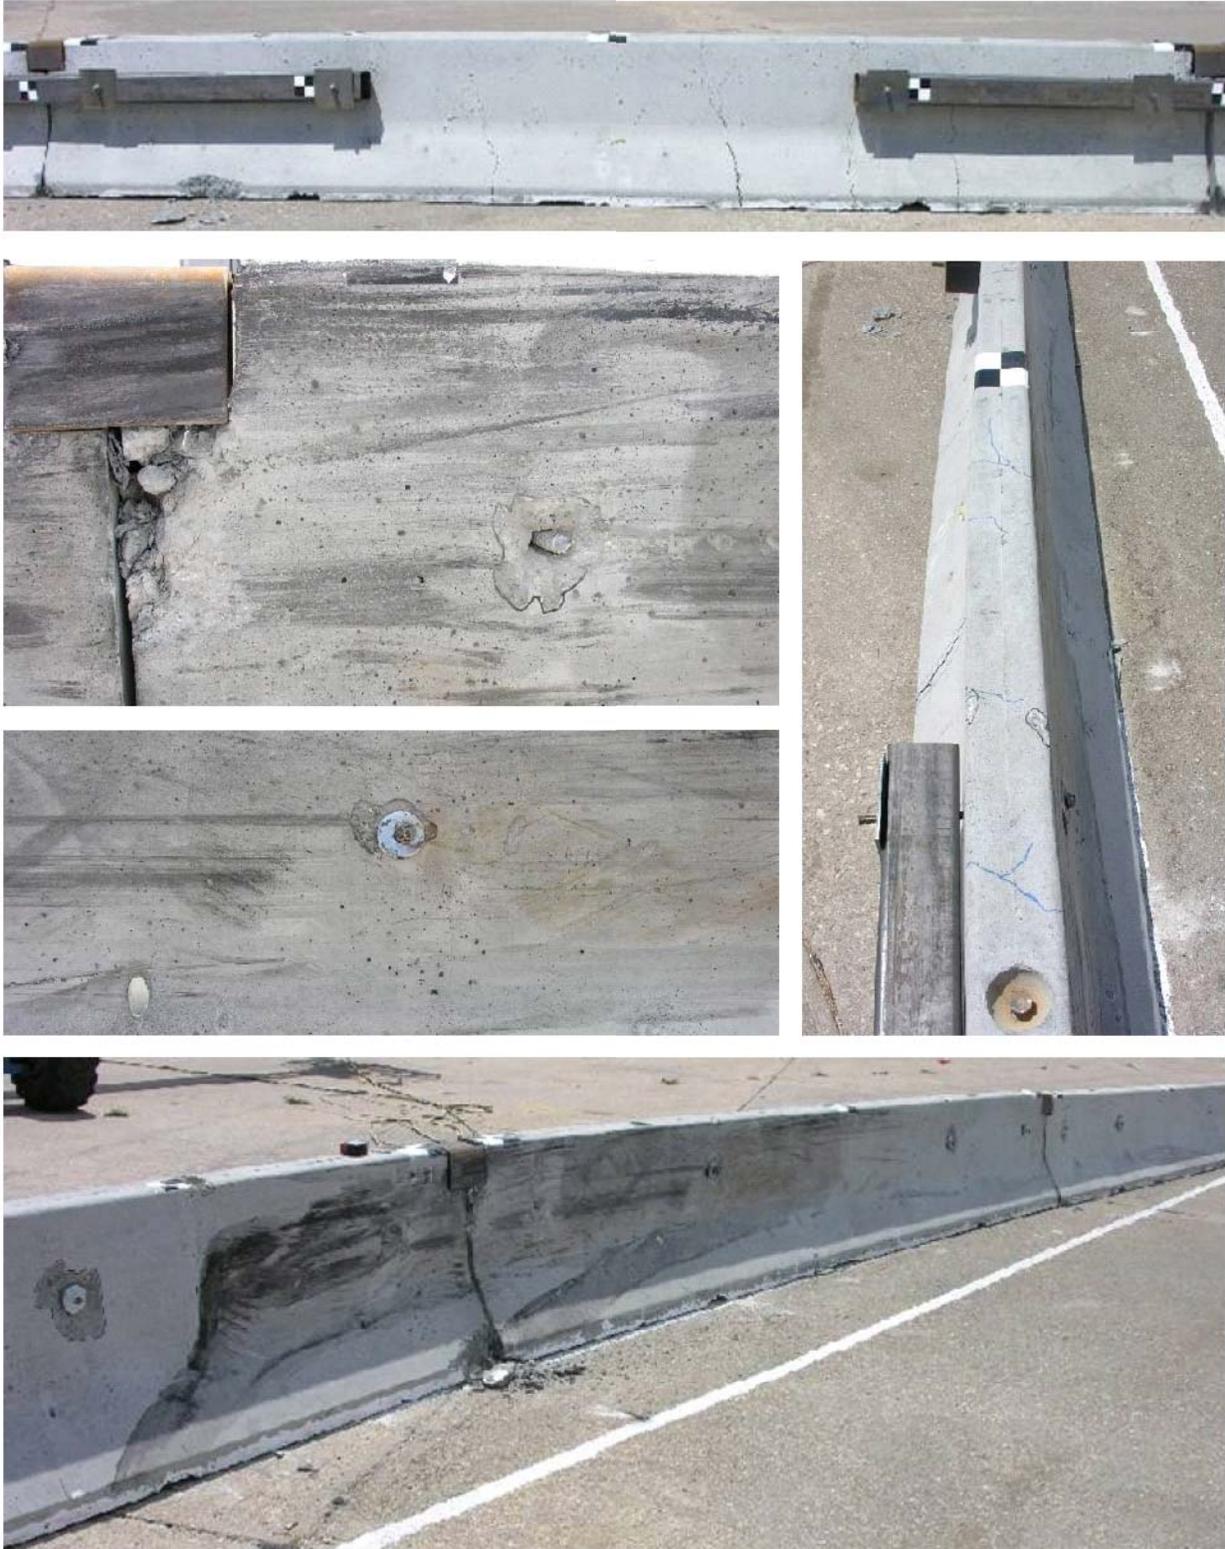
Barrier No. 5 Damage, Test NYTCB-1
